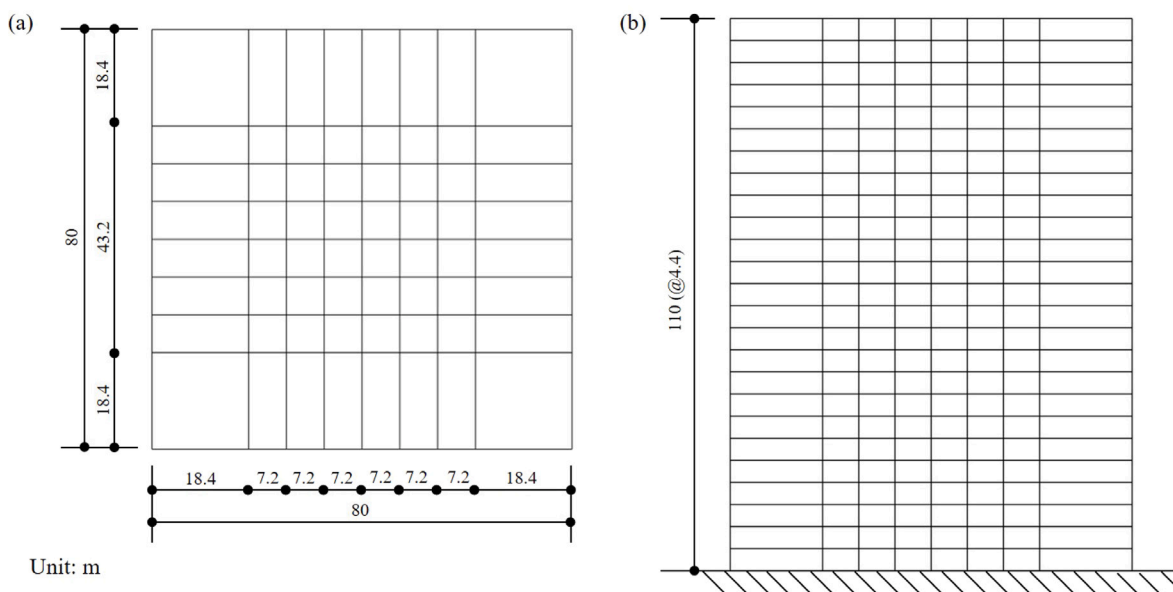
Uncontrolled MRF structure: (a) Floor plan; (b) Lateral view.
